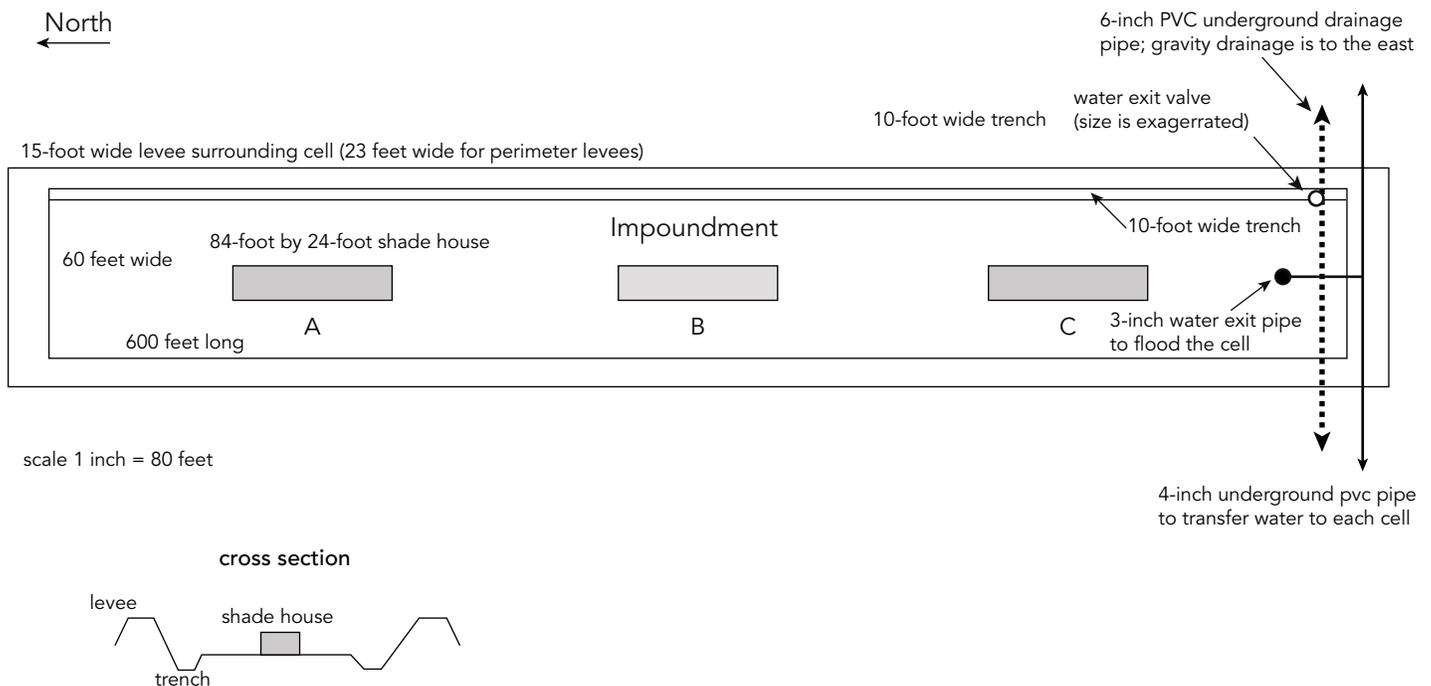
Schematic layout of an individual cell at the Flooding Research Facility including shade houses (A, B, C) and the flooding and drainage system.
